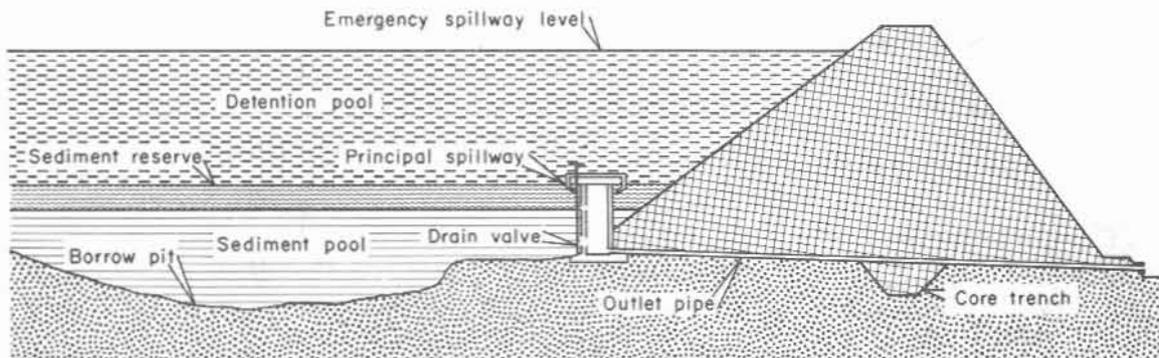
Section of a Typical Floodwater-Retarding Structure With Outlet Works
